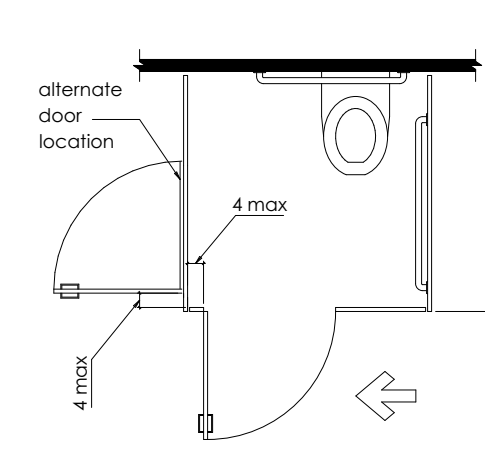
Wheelchair Accessible Toilet Compartment Doors
